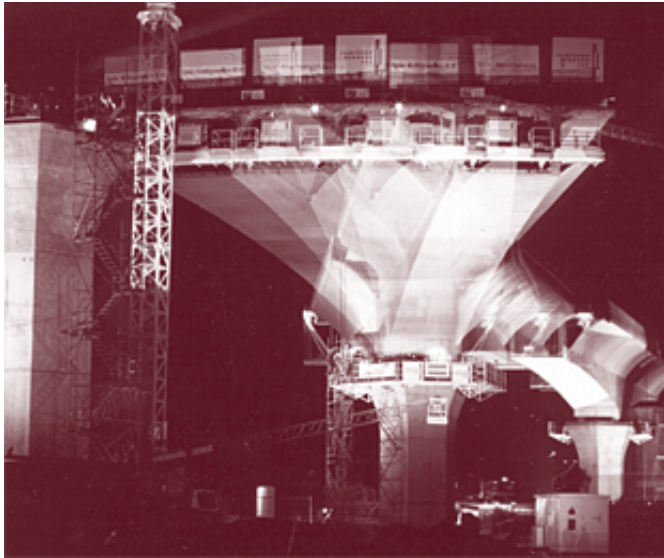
Time-lapse photo of rotating a balanced cantilever bridge.
